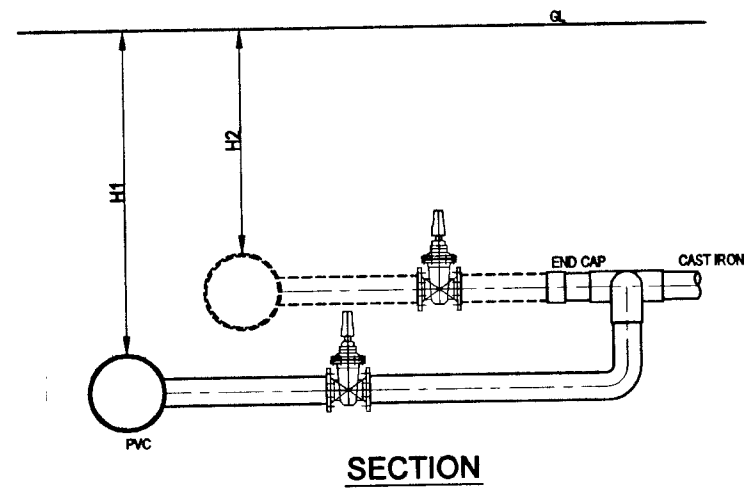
DETAILS OF SERVICE CONNECTION WHEN THE WATER MAIN AND THE PROPERTY ARE ON OPPOSITE SIDES OF THE ROAD.
